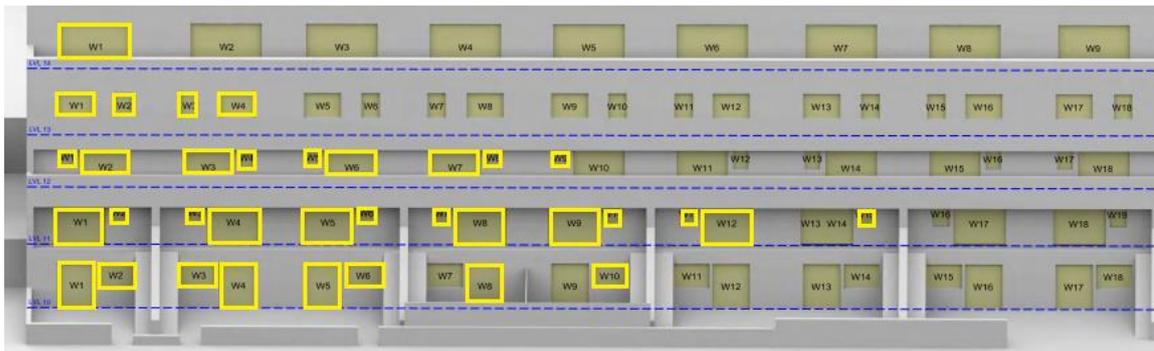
71-106 Girdlestone Walk – Windows affected by daylight transgressions
